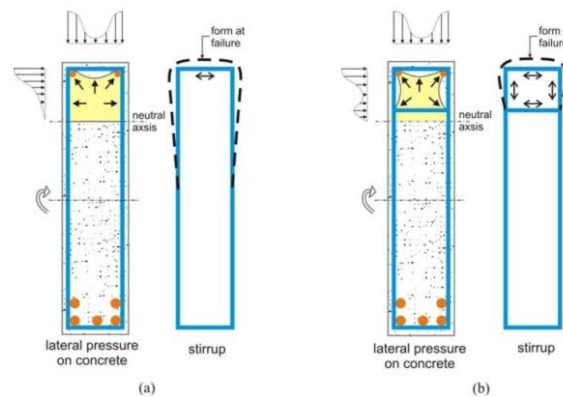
Effects of stirrup form on lateral pressure of concrete and stirrup deformation at compression concrete failure of beam
